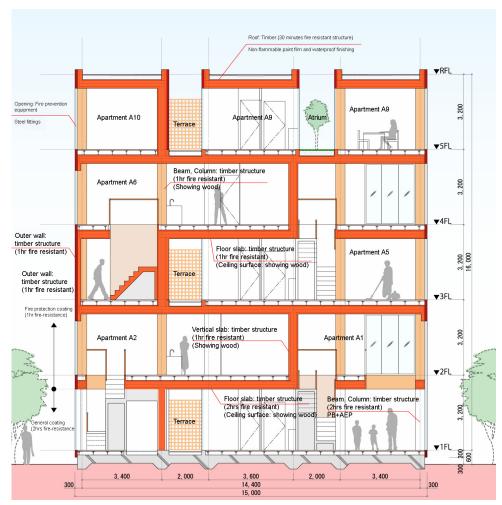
d – Section; Dimensions in [mm]
